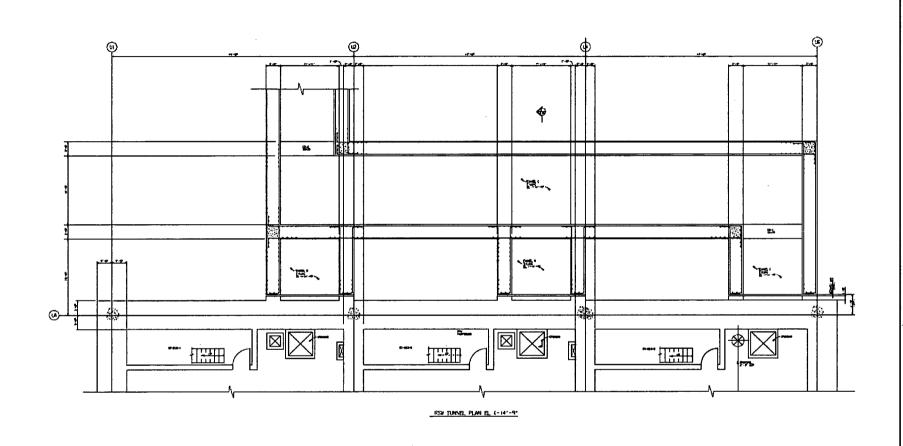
S1.269: Partial Plan of RSW Piping Tunnel and RSW Pump House
